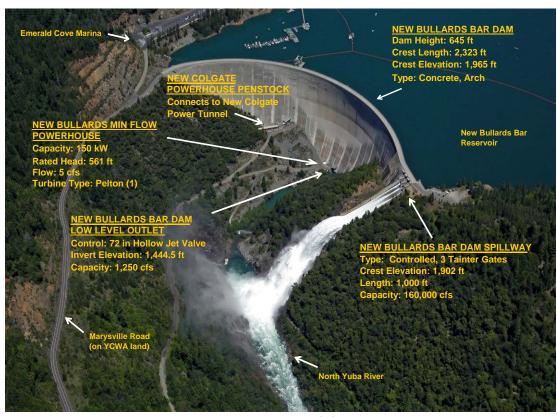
New Bullards Bar Dam and New Bullards Bar Minimum Flow Powerhouse.
